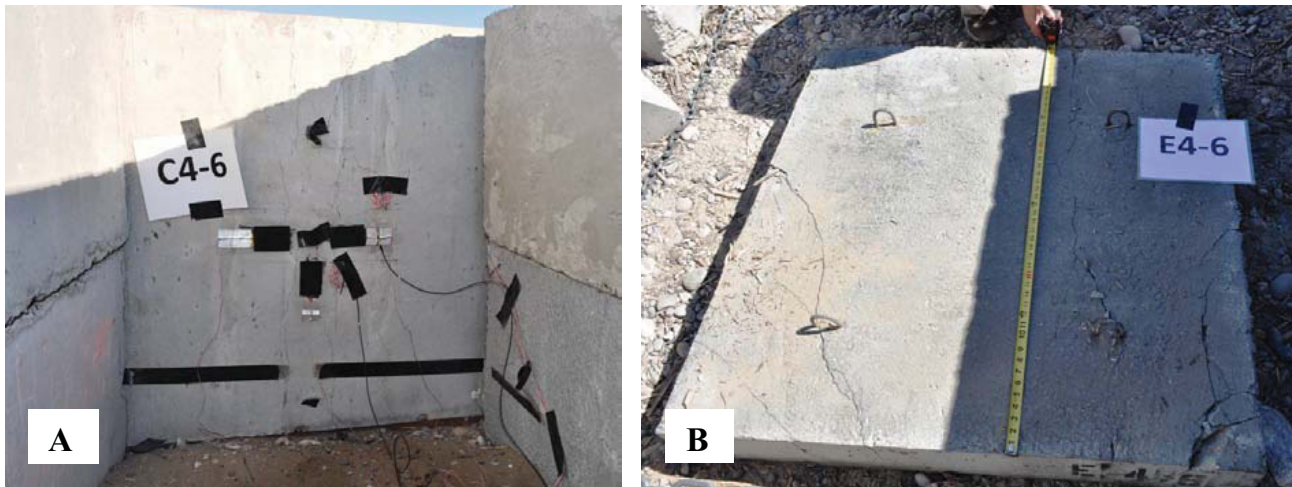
(A) FRC panel C4-6 with steel rebar, (B) NWC panel E4-6 with steel rebar and GFRP overlays.
